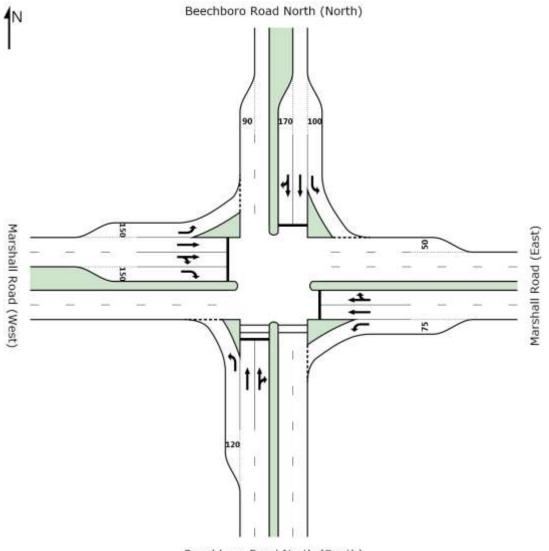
Proposed Intersection Layout of Marshall Road and Beechboro Road North
